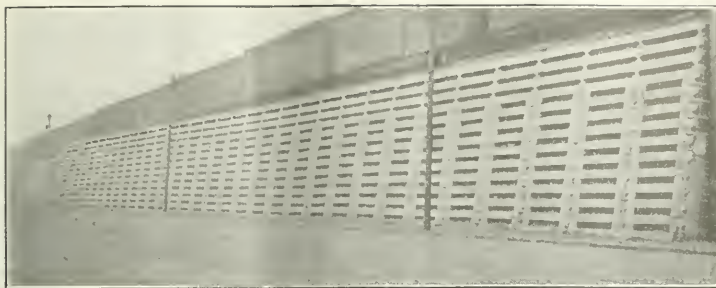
TEMPORARY SECTIONAL CONCRETE RETAINING WALL
